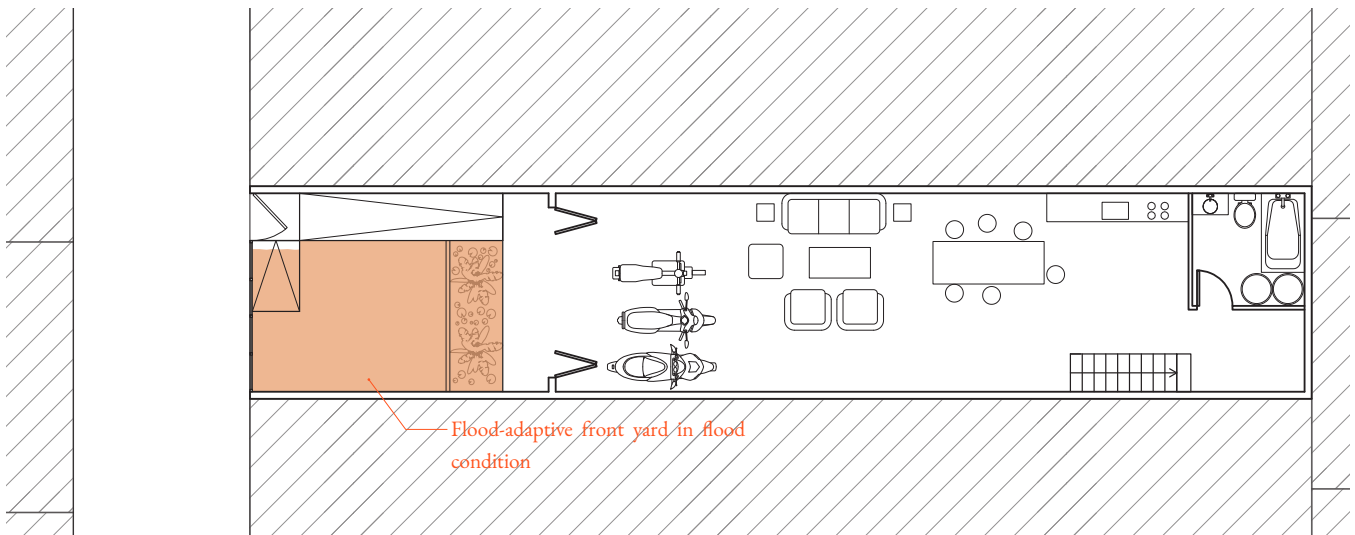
Plan of retrofitted alleyway house with front yard in flood condition.
